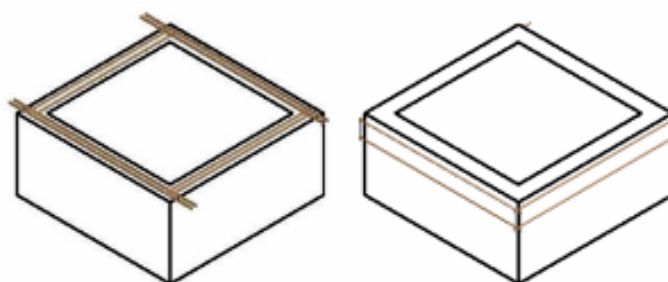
Timber Bond Beam (left) traditional and (right) a Nepali vernacular technique which includes vertical wooden ties at each corner, as described and reintroduced by Sikka and Chaudry (2006).
